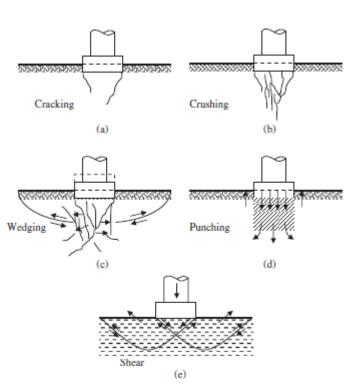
Modes of failure of a footing on rock including development of failure through crack propagation and crushing beneath the footing (a-c), punching through collapse of voids (d), and shear failure (e) (based on Goodman, 1989).
